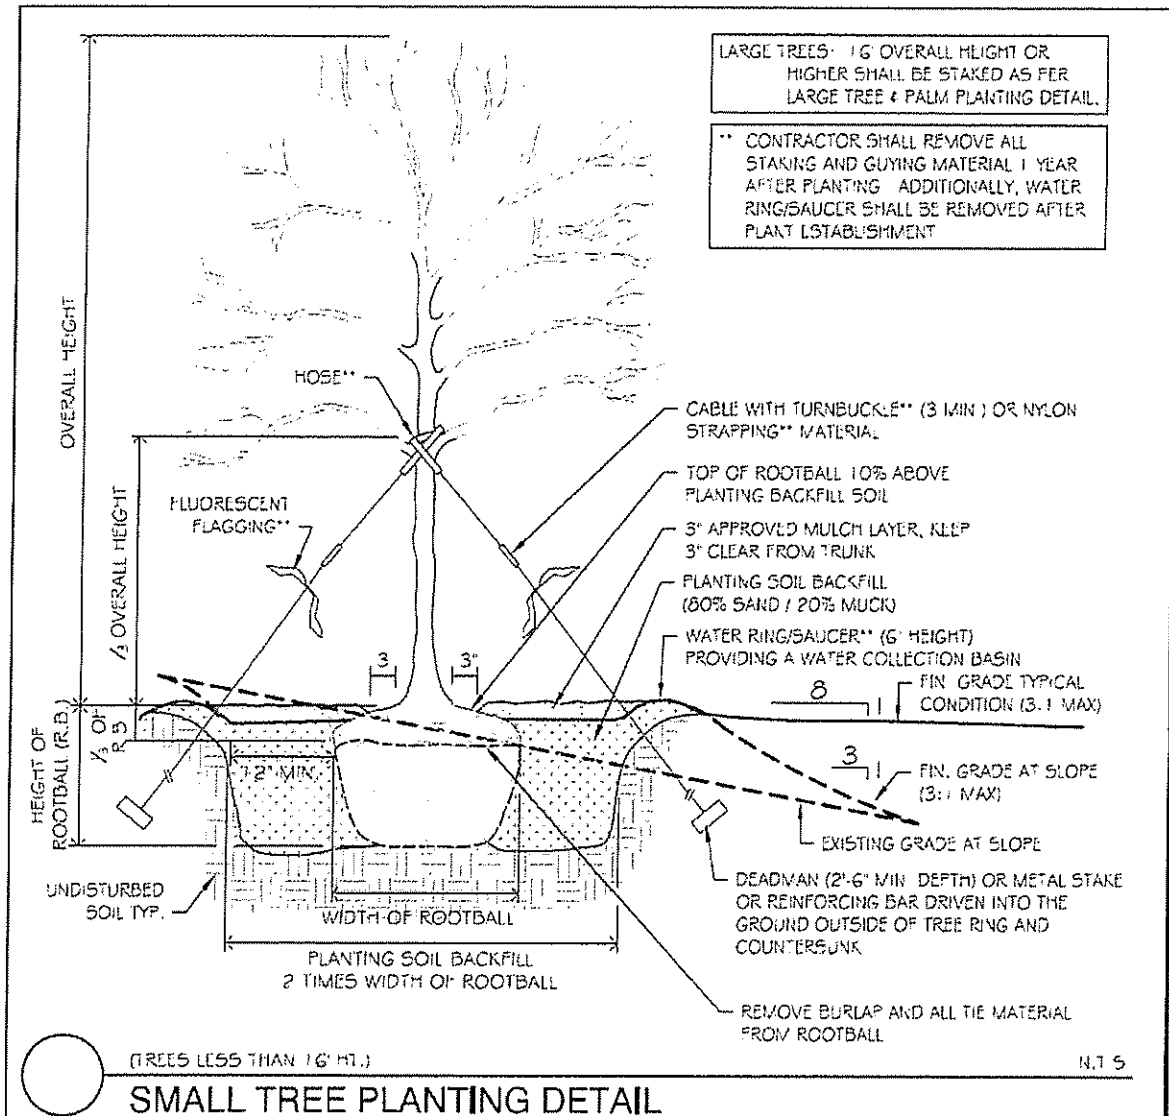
(D) – SMALL TREE PLANTING DETAIL
